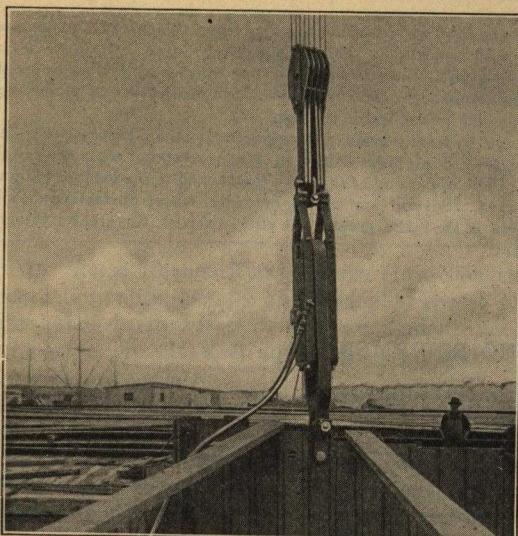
Pulling steel sheet piling with inverted hammer.
